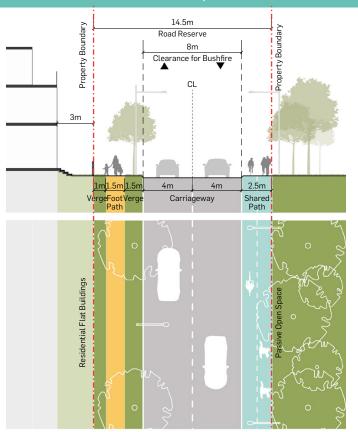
Indicative Street Section F-F' - Access Place - Bushfire Compliant
